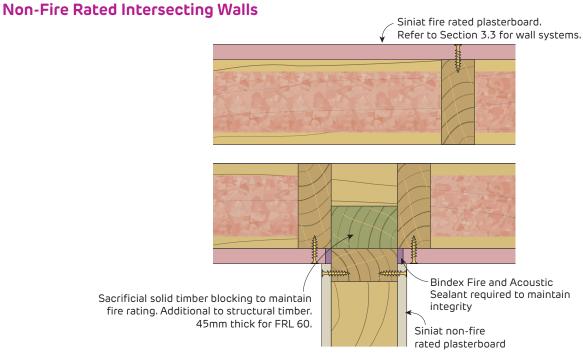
Separating Wall with Non-Fire Rated Intersecting Wall
